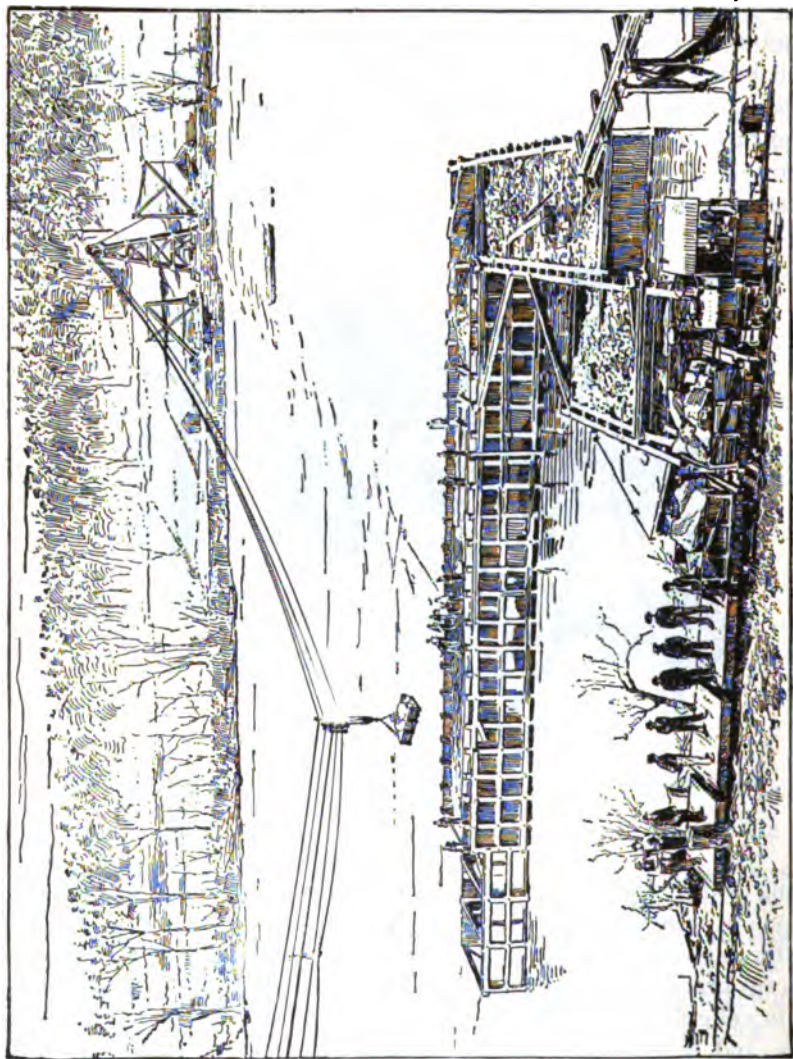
LIDGERWOOD CABLEWAY AT COOSA DAM. SPAN 1012 FEET.
